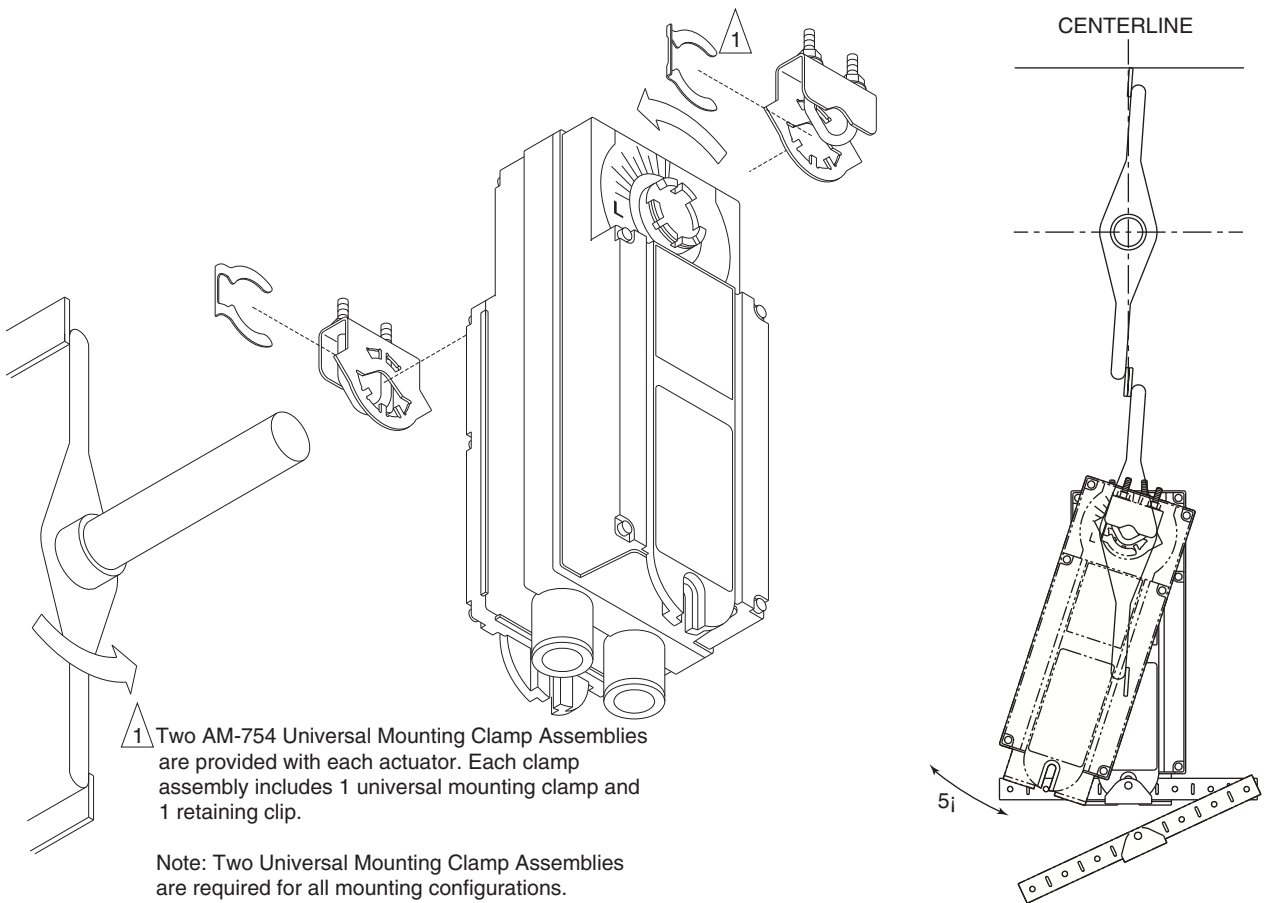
Long Damper Shaft Mounting with Counterclockwise Spring Return for Normally Closed Damper.
